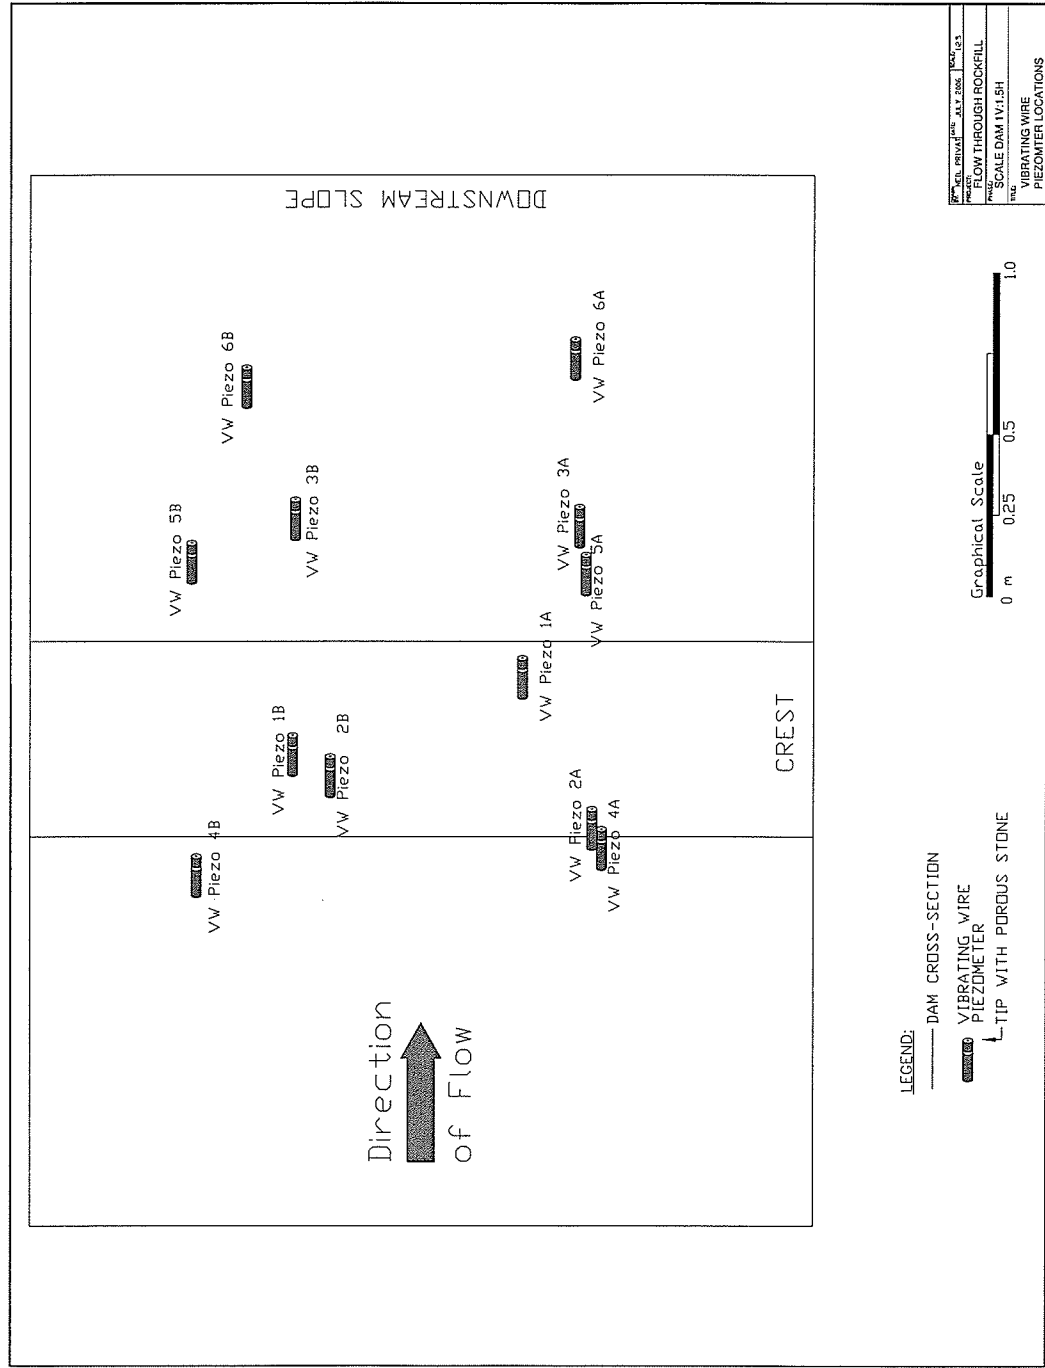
Scale Dam 1V:1.5H, Plan with Locations of Vibrating Wire Piezometers
